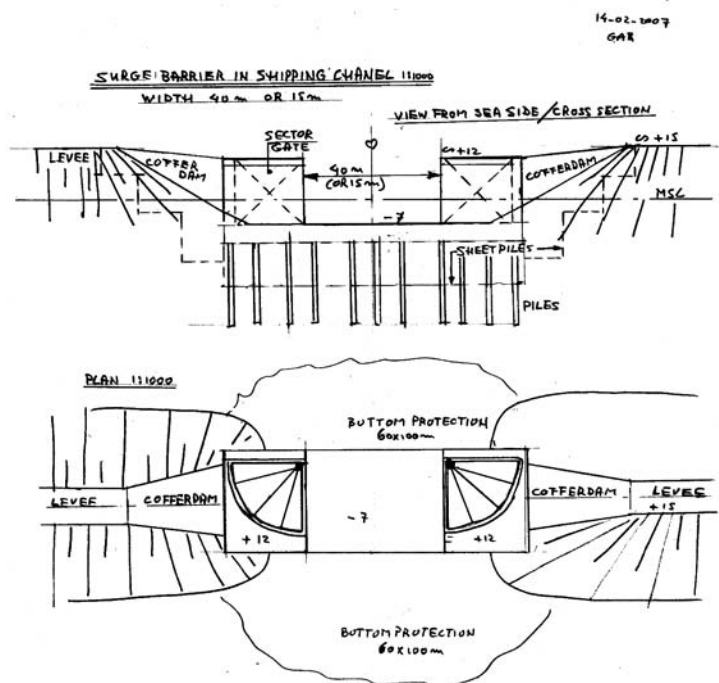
Top view and cross section of a surge barrier in a navigation channel.
